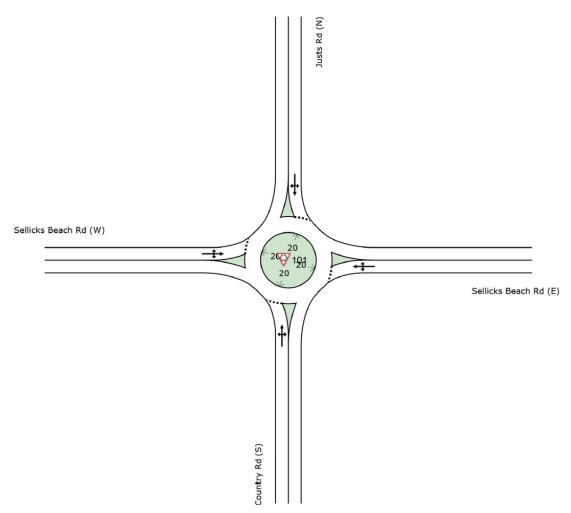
A concept of the Sellicks Beach Road/Justs Road/Country Road intersection upgrade
